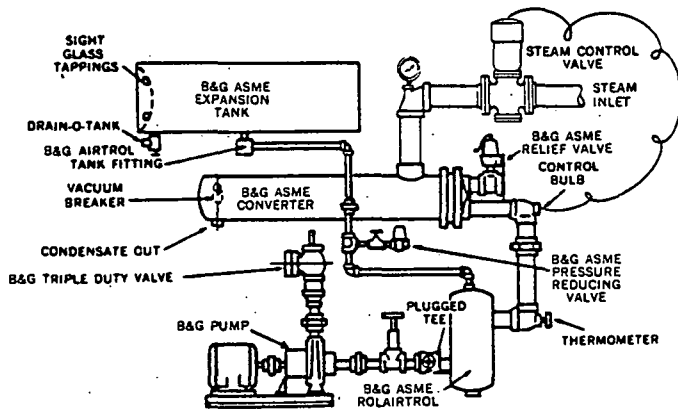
Typical installation of "SU" Heat Exchanger when used as a Converter.
